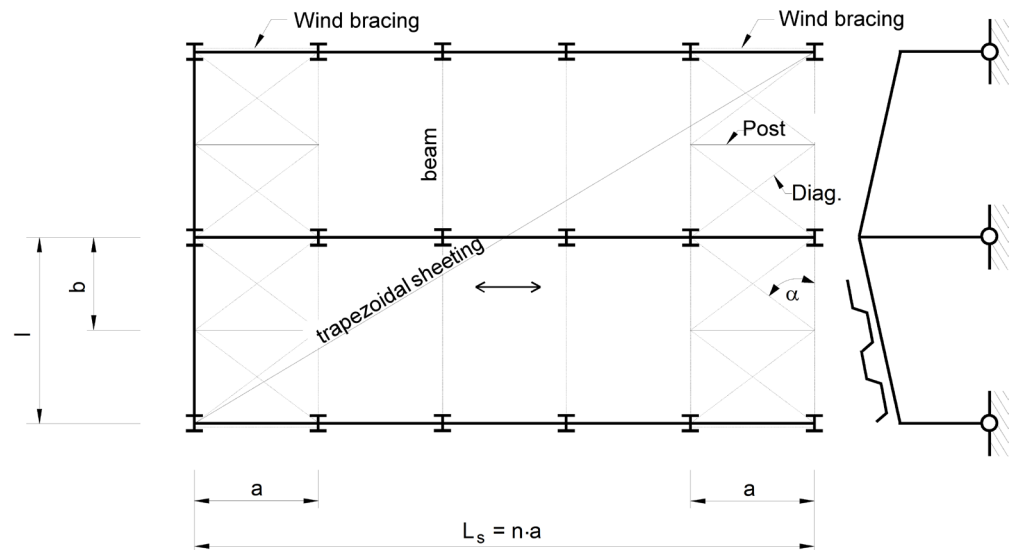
Frame beam with trapezoidal sheeting and bracings
